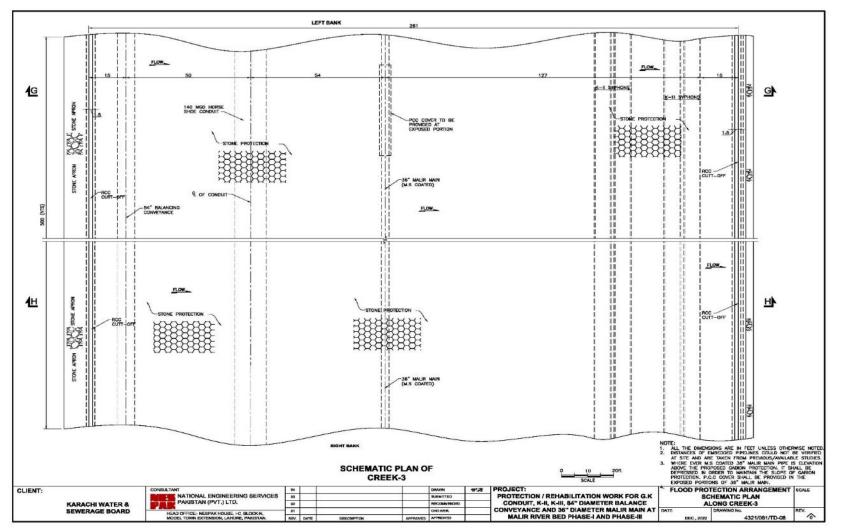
Flood Protection Arrangement Schematic Plan (Creek 3)
